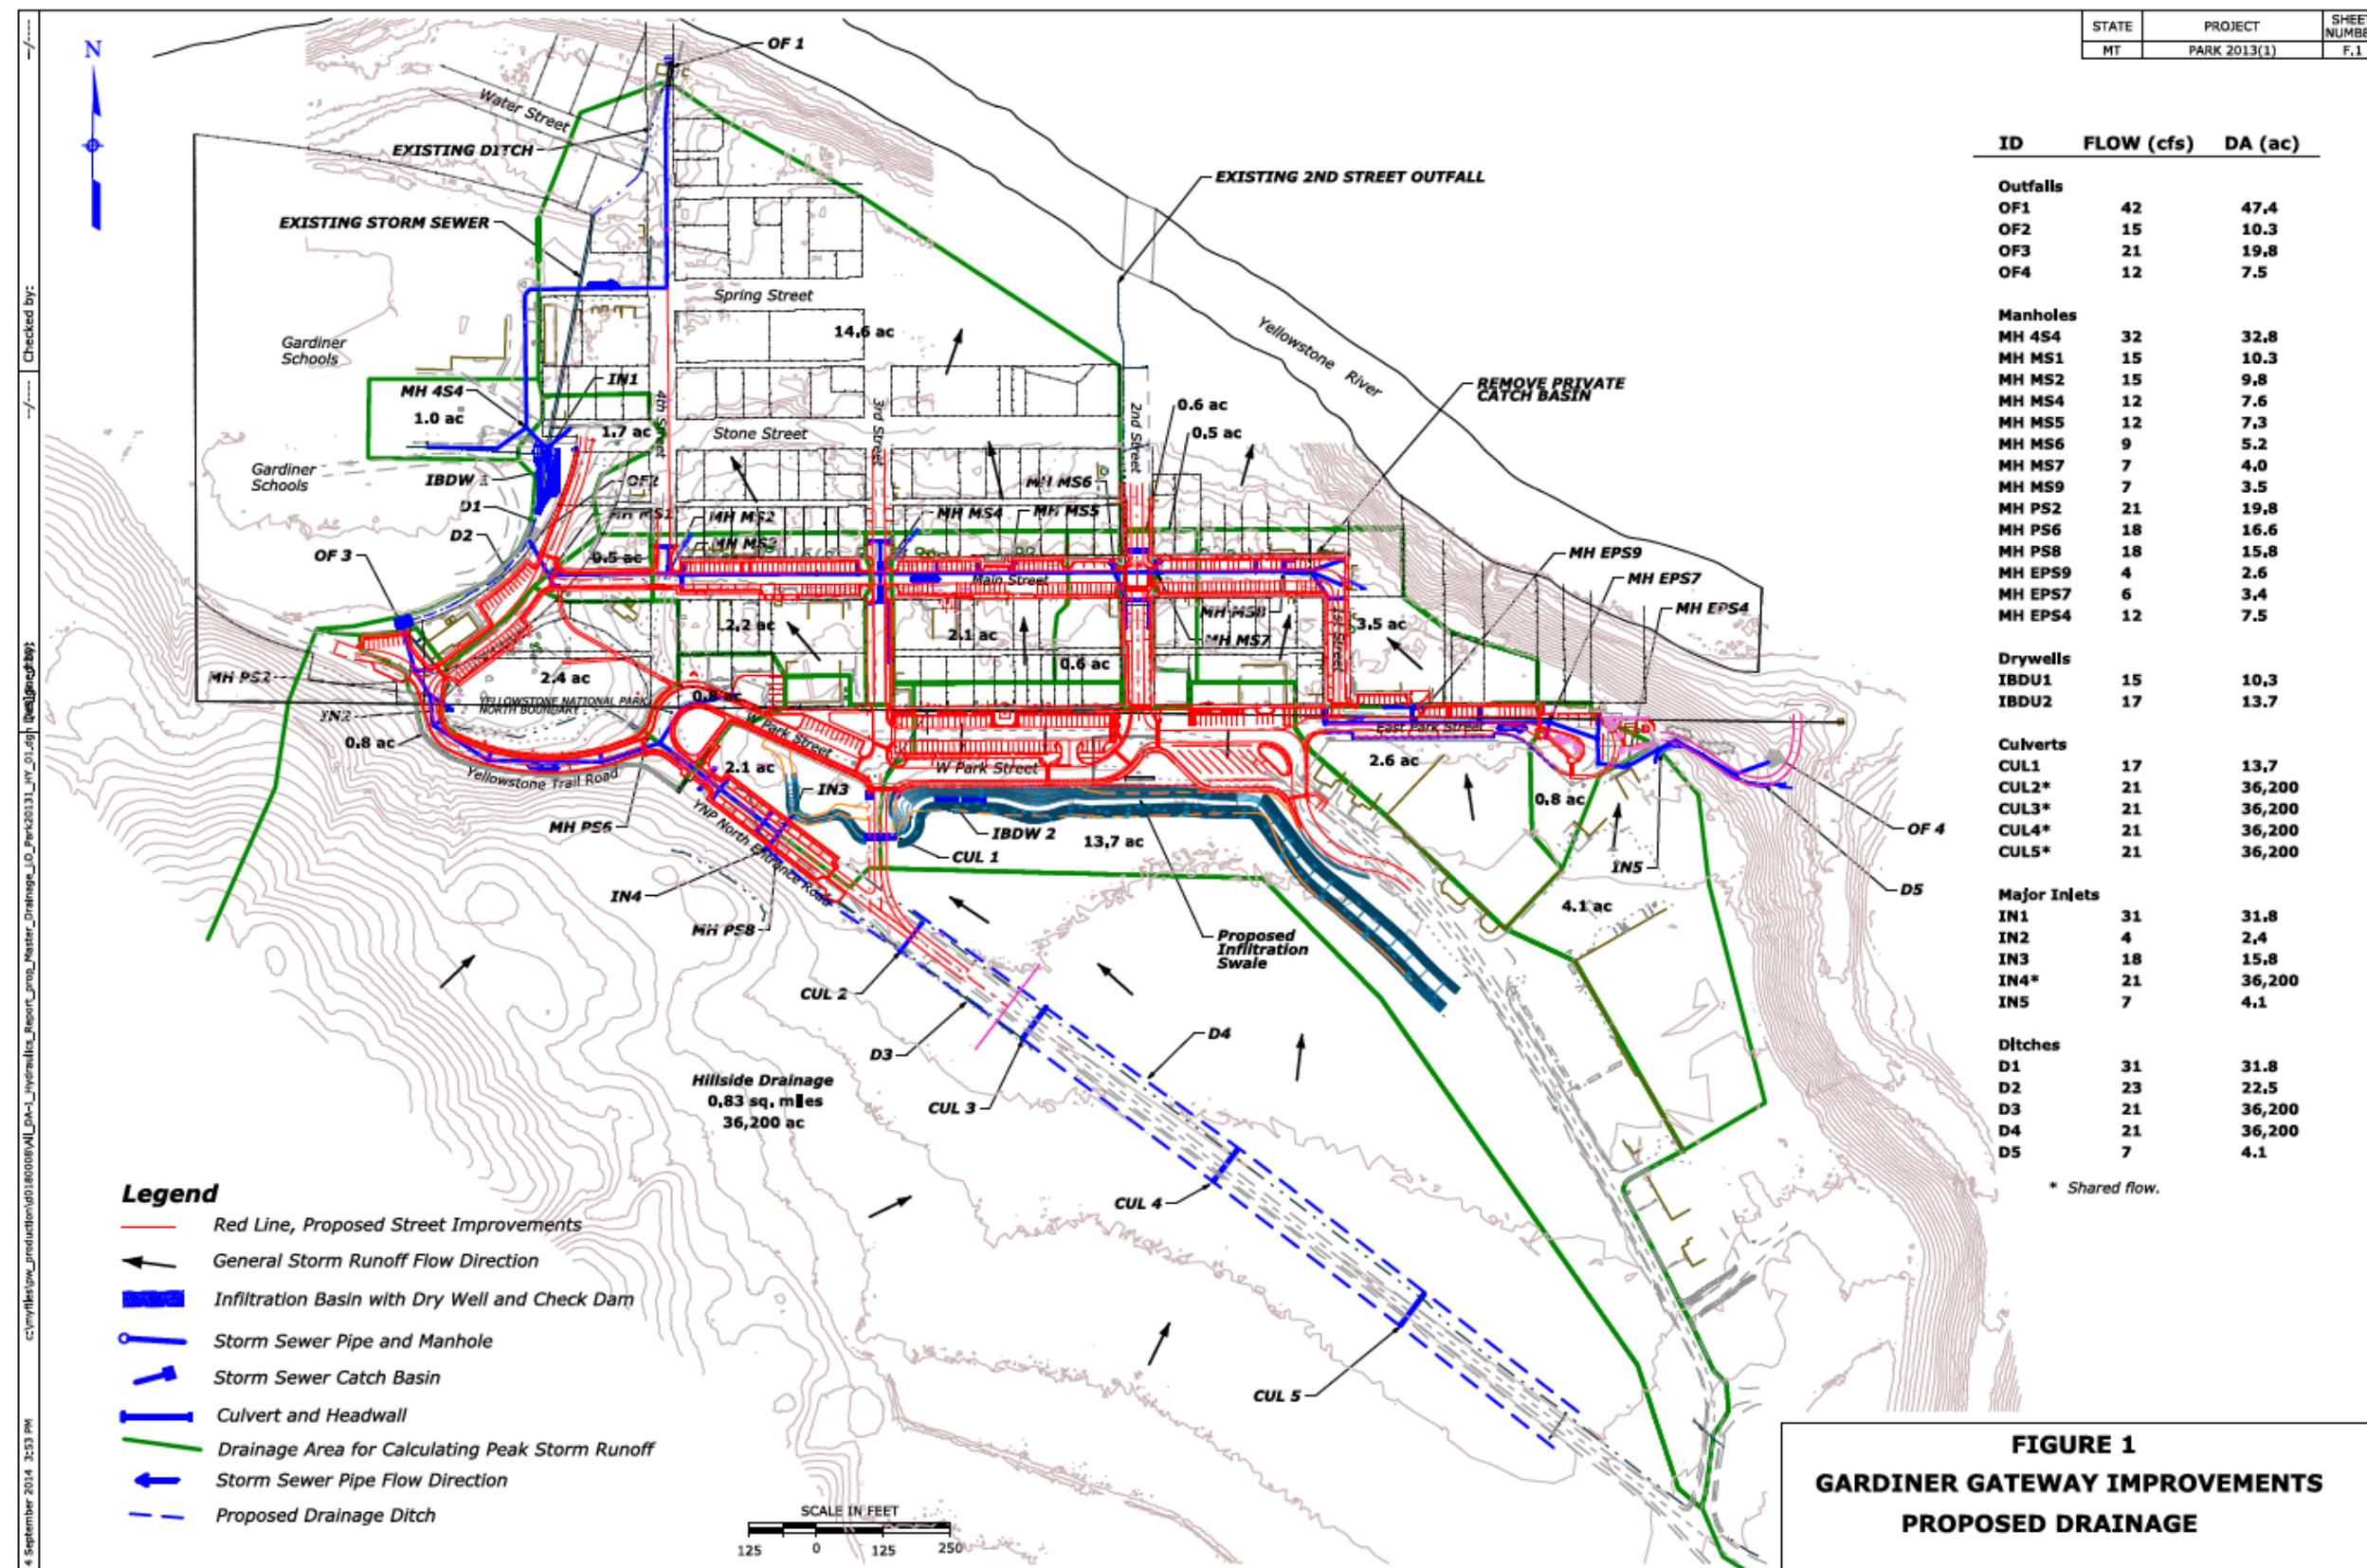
Gardiner Gateway Stormwater Management – Improvements.
